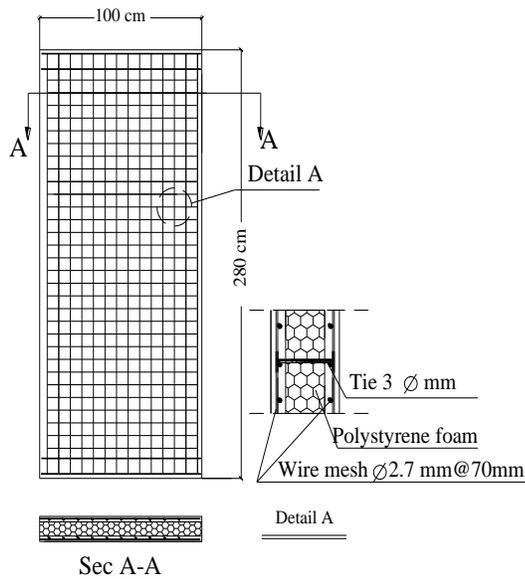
Dimensions and steel layout of sandwich panel specimen SW1.
